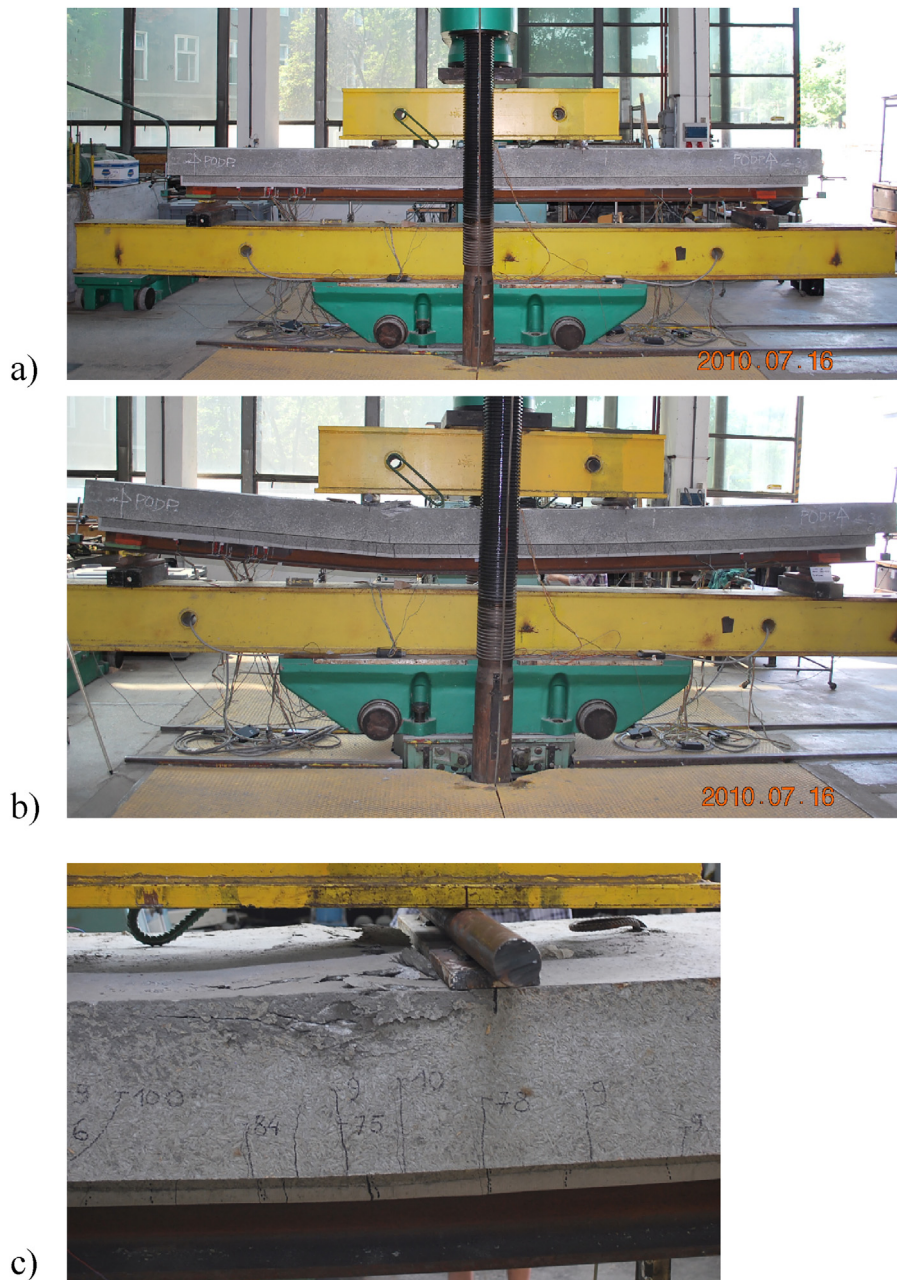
General view on B1 beam before (a) and after (b) tests and (c) arrangement of cracks in concrete slab. Cracking in compressive zone is visible.
